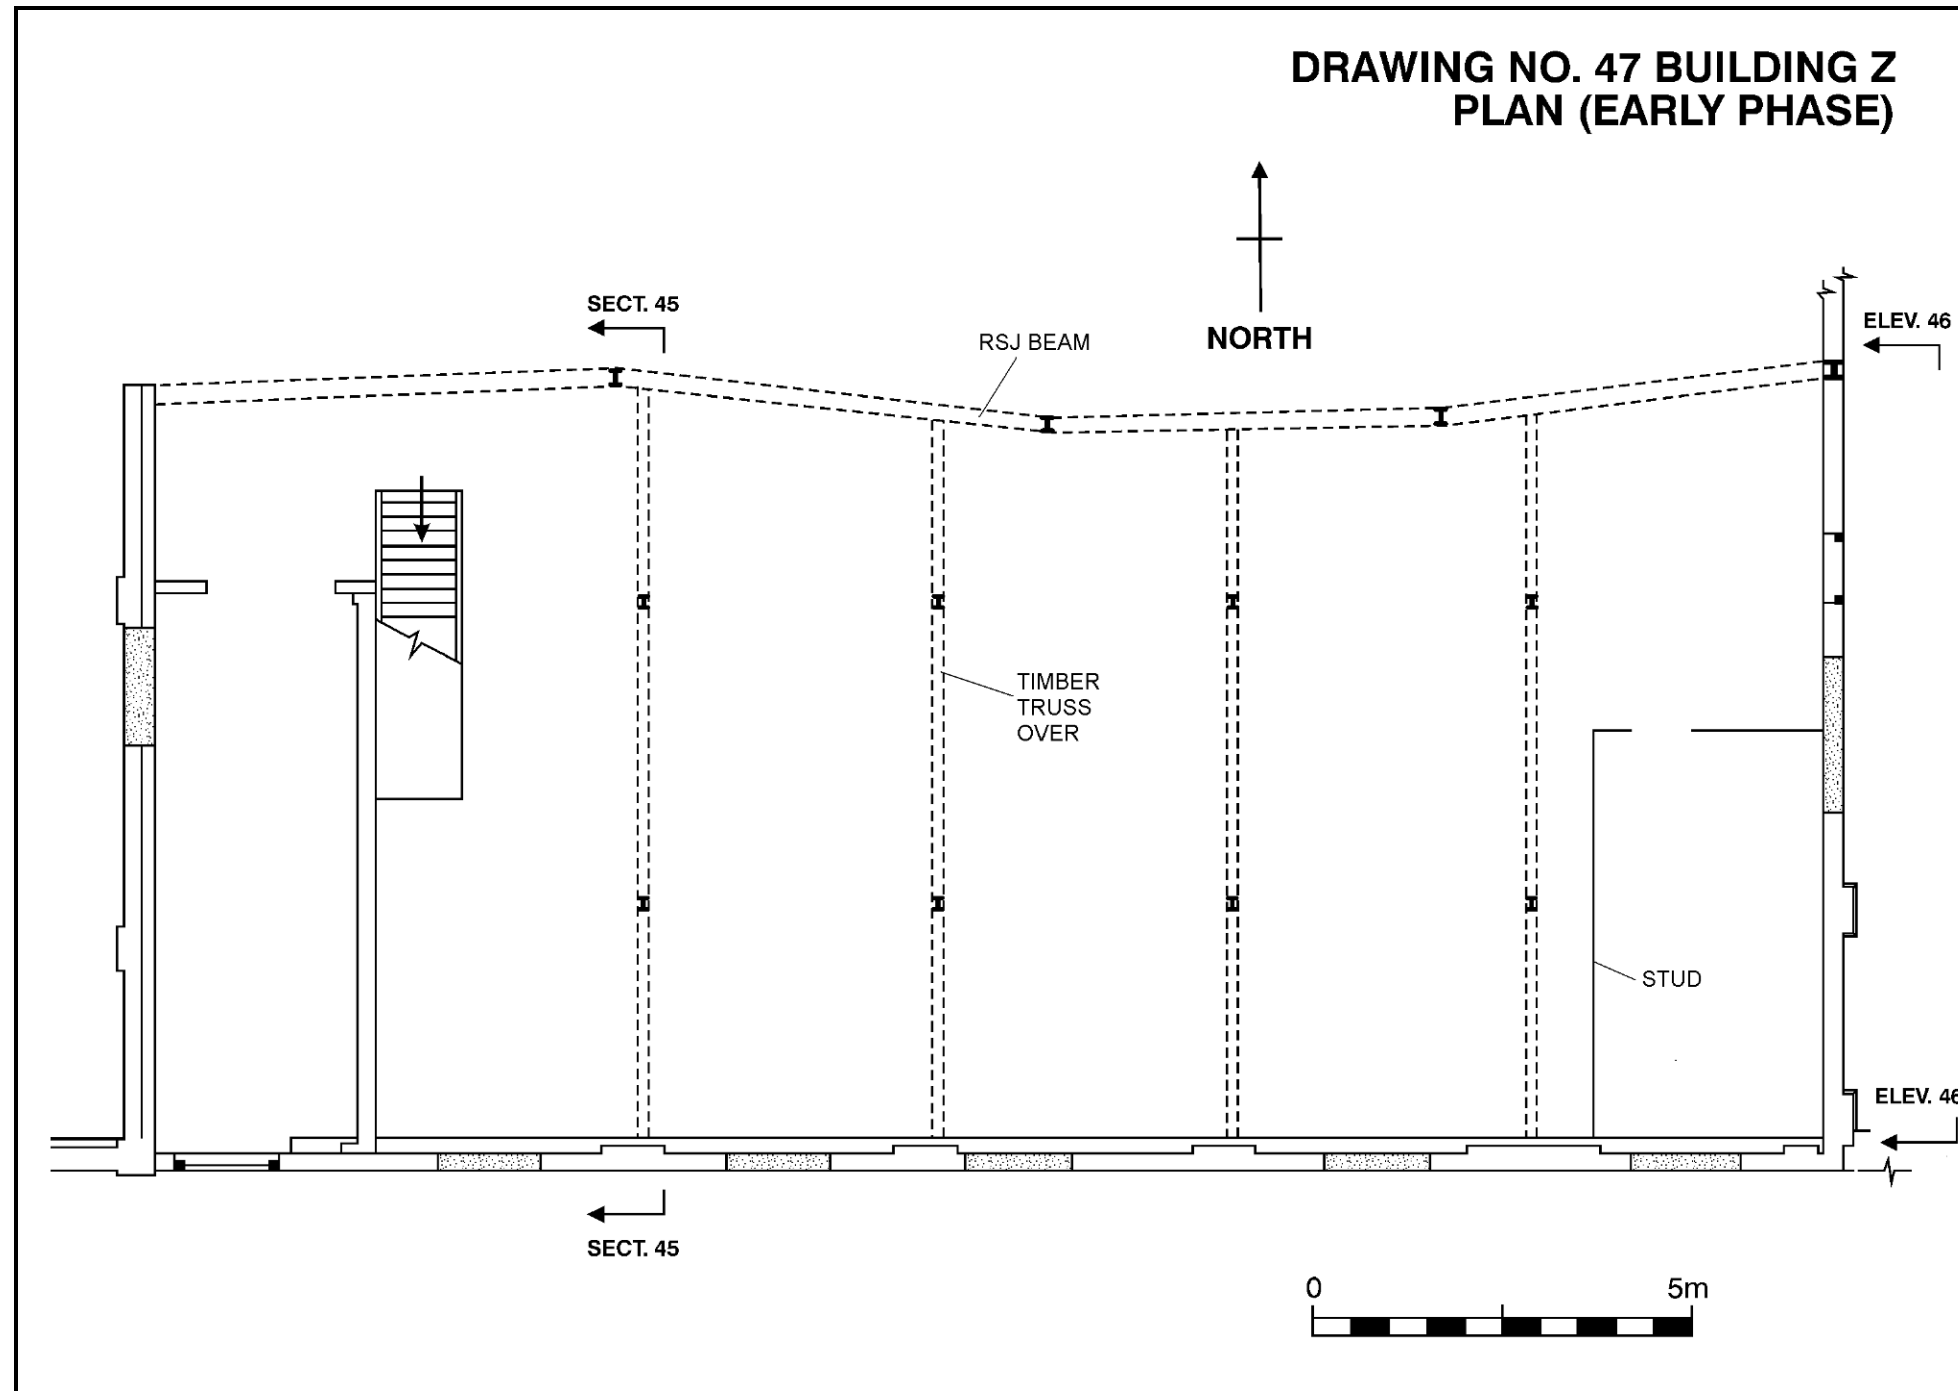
Plan of the New Mould Shed in Building Z (scale 1:100)
